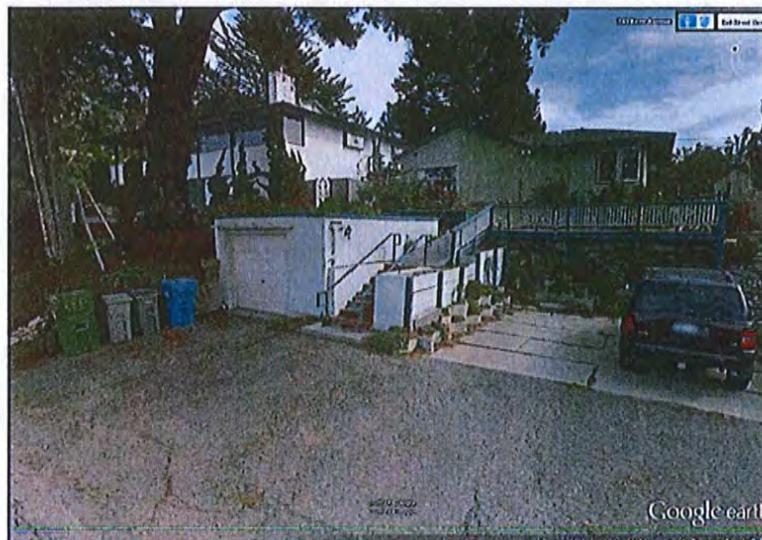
AC apron, driveway, brick stairs, the tree, planter, ramp, modular retaining structure, and deck
